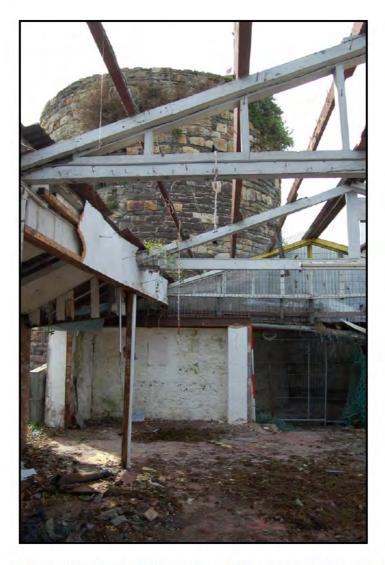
YARD 4 (PRN 30463): Building 14 (PRN 30465): The rear of the building included the town wall (whitewashed) and the interior of Building 14. (Ranging pole: 2.0m)
